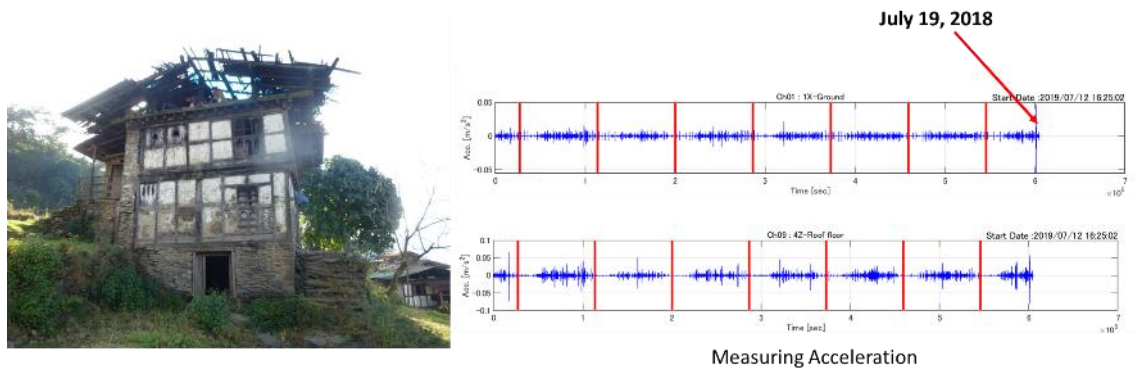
Monitoring of Stone Masonry building in Samcholing, Trongsa
